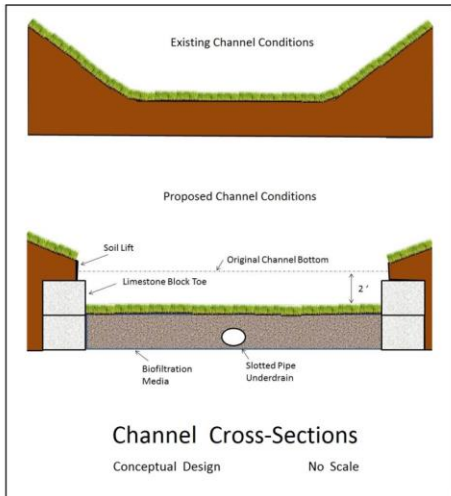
The Big Ditch Retrofit: Concept Plan
